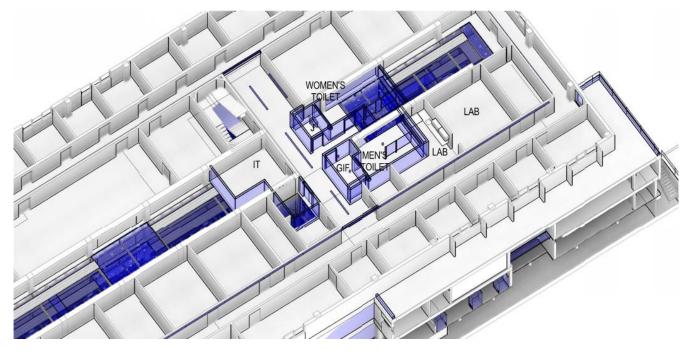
Phasing Diagram New Floor Plan, Level 4
